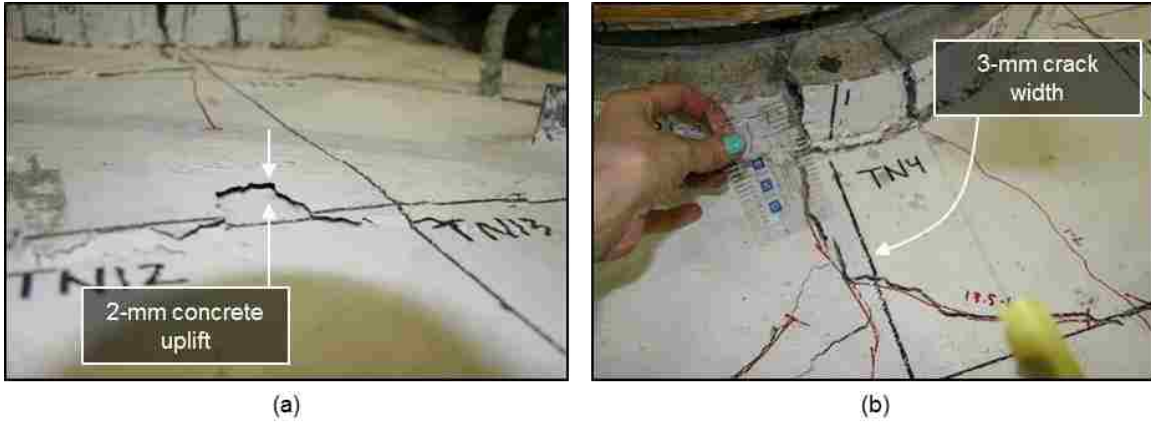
WRC South cap beam concrete uplift at 8.33% drift North
